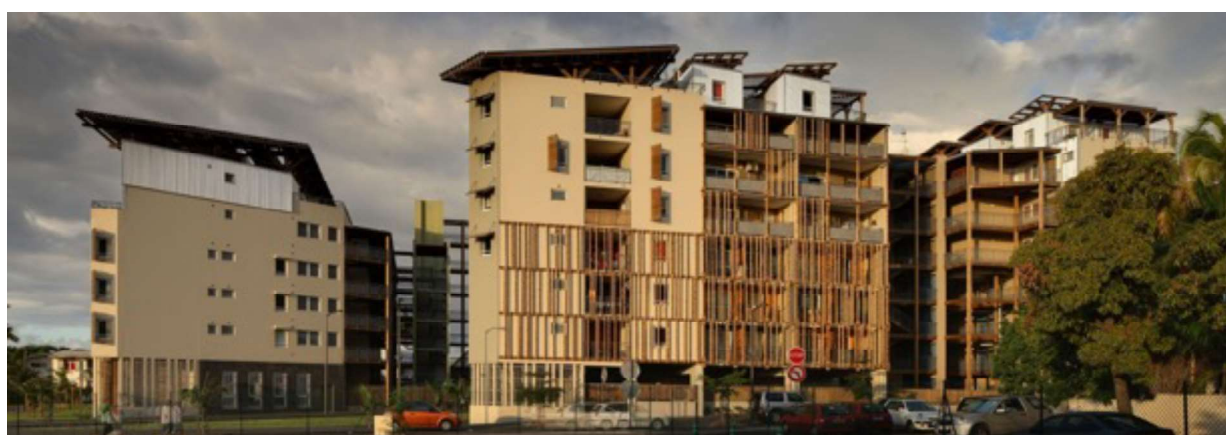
Exterior view of the facades showing the different types of finishing materials used for the exterior walls, i.e., ONDULIT sheet panels and fibre cement siding. © Hervé Douris.
